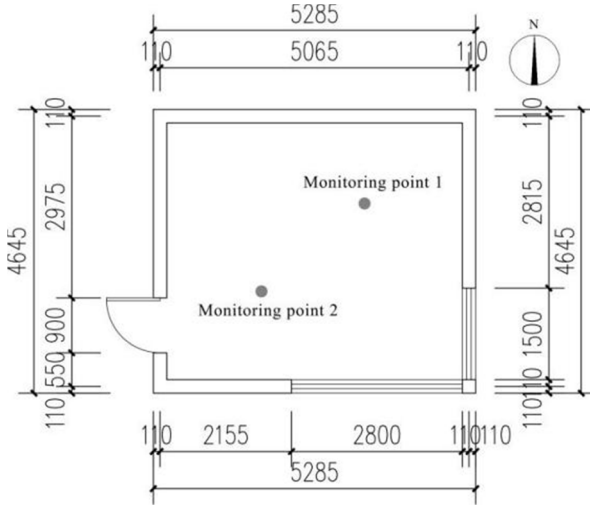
Plan of the new straw brick building and marking of the location of the survey points.
